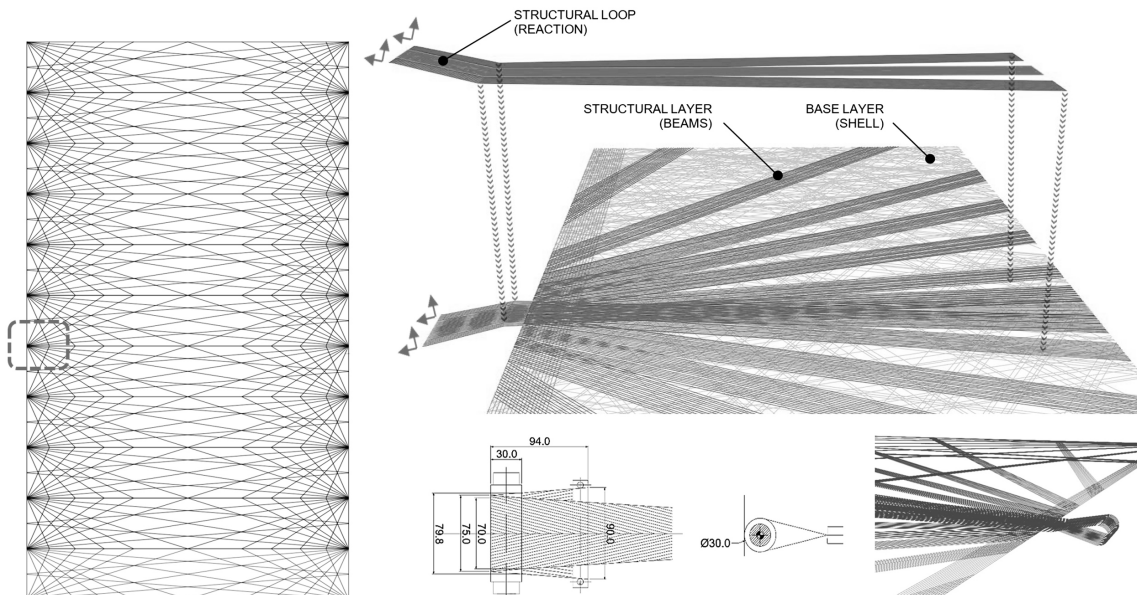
blueprint of architectural mesh 22x10.5 m and detail on anchor loop
